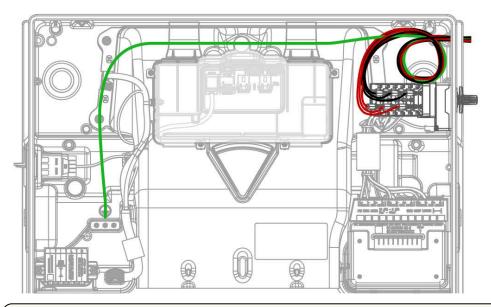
Powerwall 3 PV Wiring and Protective Earth (Entering from Right)
